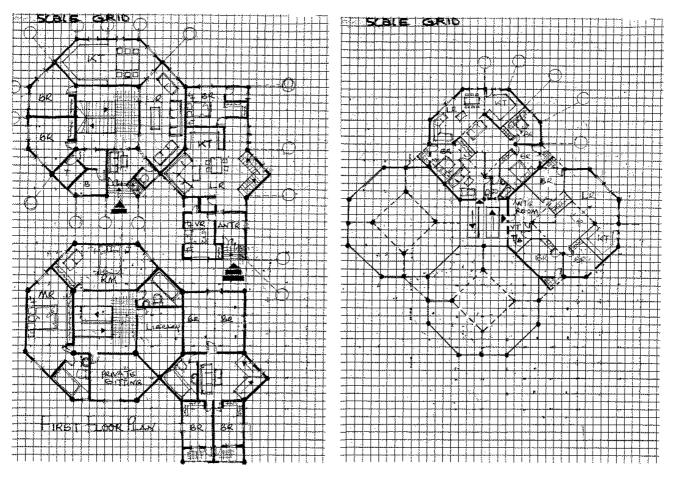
Typical 2D floor tessellation plan done using traditional method (source: by Author).
